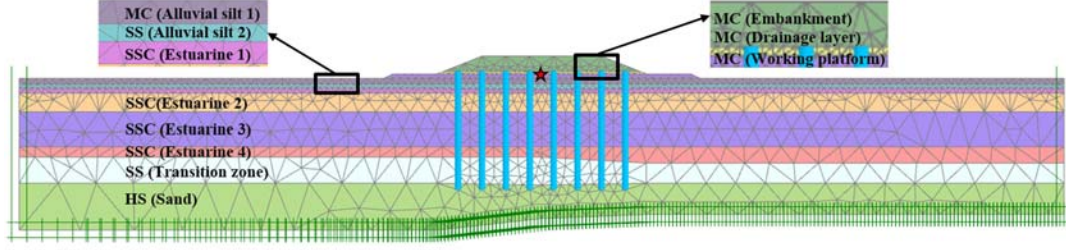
Geometry of finite-element model of Ballina trial embankment (After Jostad et al., (2018))
